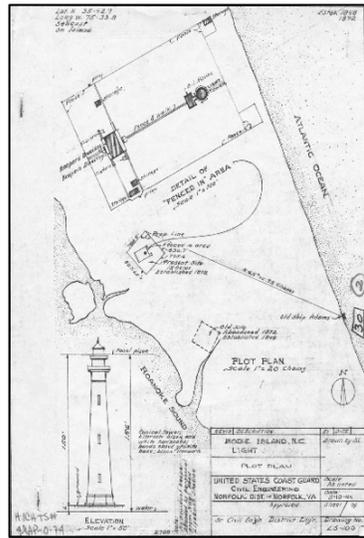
Plot plan, 1944. (CAHA Collection)
